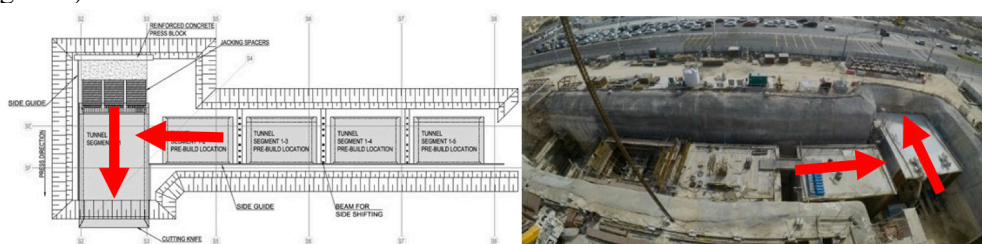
Subway 1 construction: Segments layout drawing and Box jacking sequence (left) and aerial photo (right)
